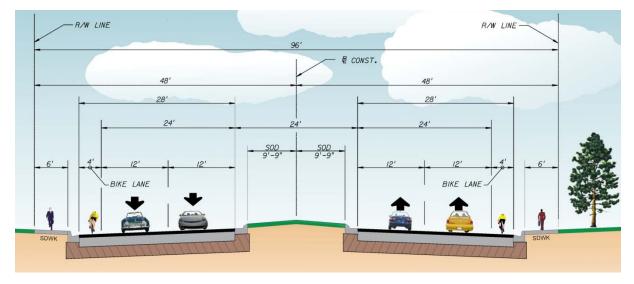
Existing Typical Section (SR 87S and SR 87N)
